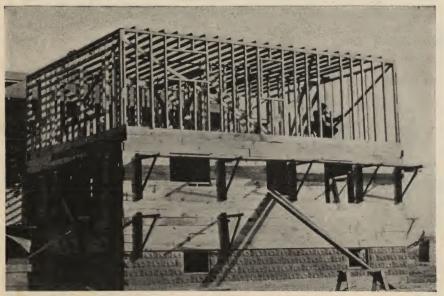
Cutting 18-Foot Studs for Windows Is Another Unnecessary Waste.
